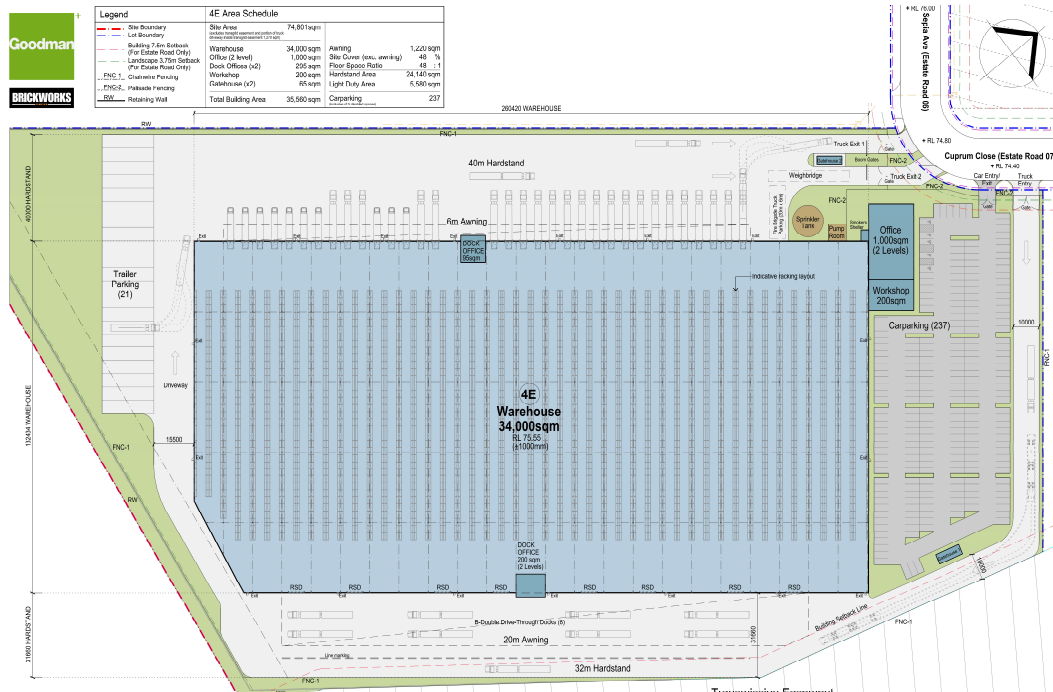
Proposed layout of Building 4E (Source: Goodman)
